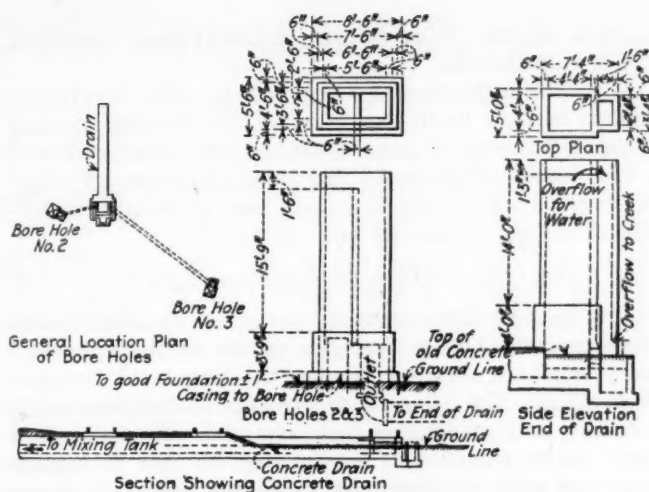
PLAN OF CONCRETE SETTLING TOWERS AND DRAIN FOR CRUDE MINE WATER
